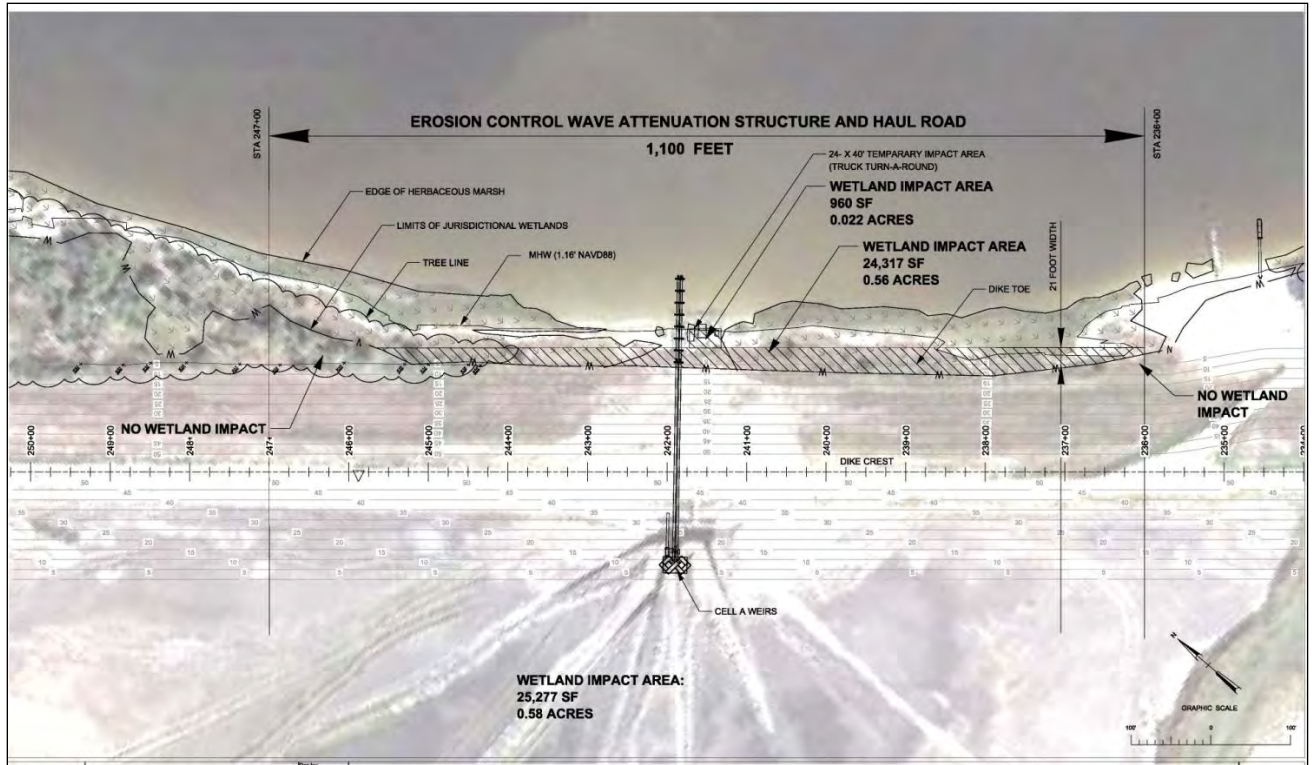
Plan view of impact area from footprint of wave attenuation structure.
